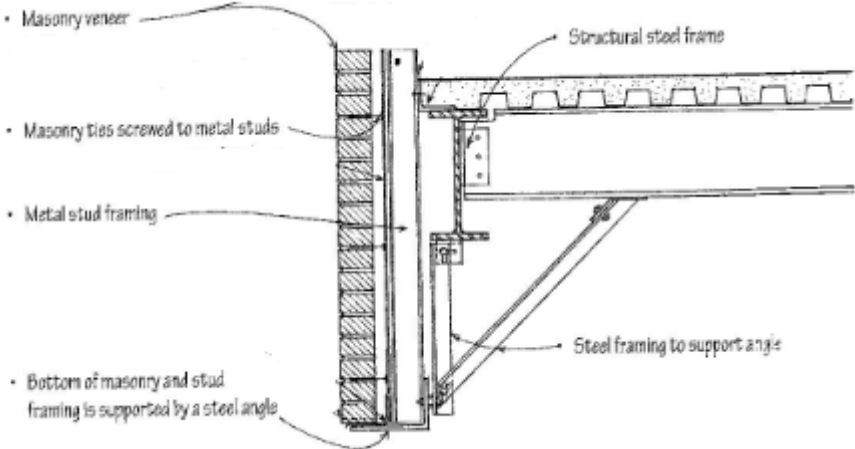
Brick veneer attached to metal frame (Ching, 2008)
